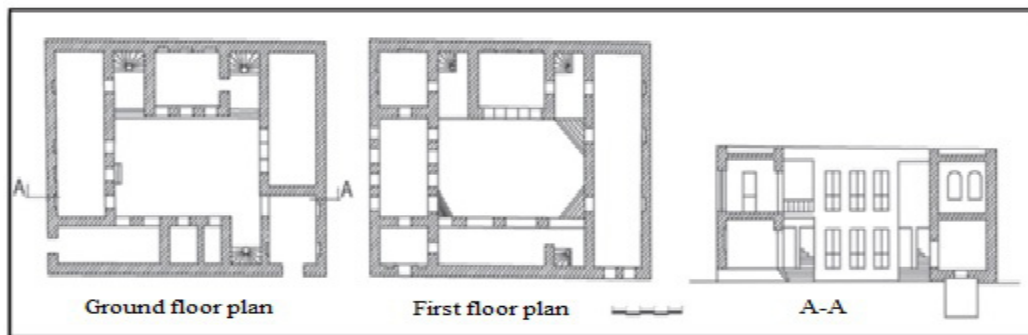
Plan of the ground and first floors of a building with a traditional structure inverted Tabriz (Memarian, 2007)
